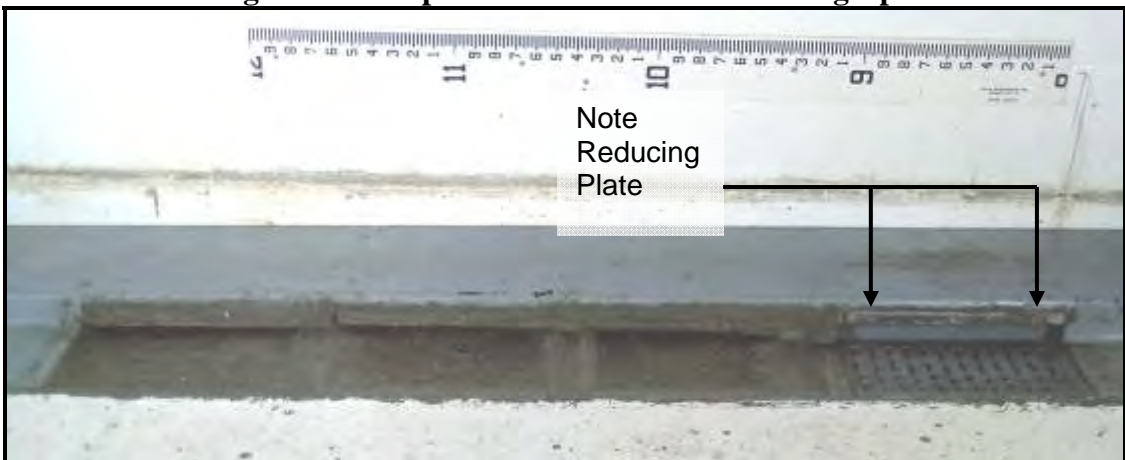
Single No. 16 with 4-in. Curb Opening Photograph
